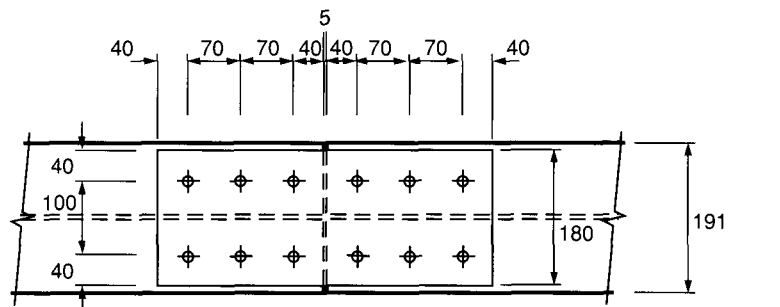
Bearing resistance of flange splice (dimensions in mm)
